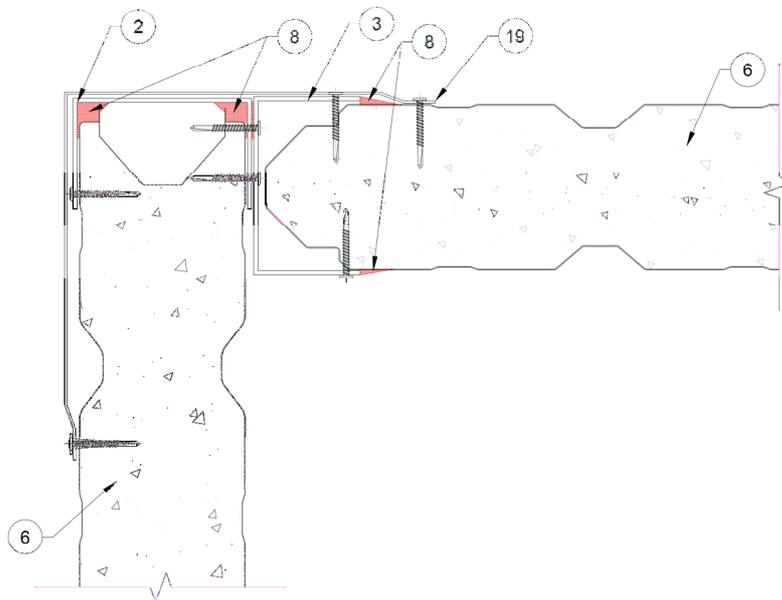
Corner Detail of Bulkhead Construction with two Vertical Speedpanel Walls
